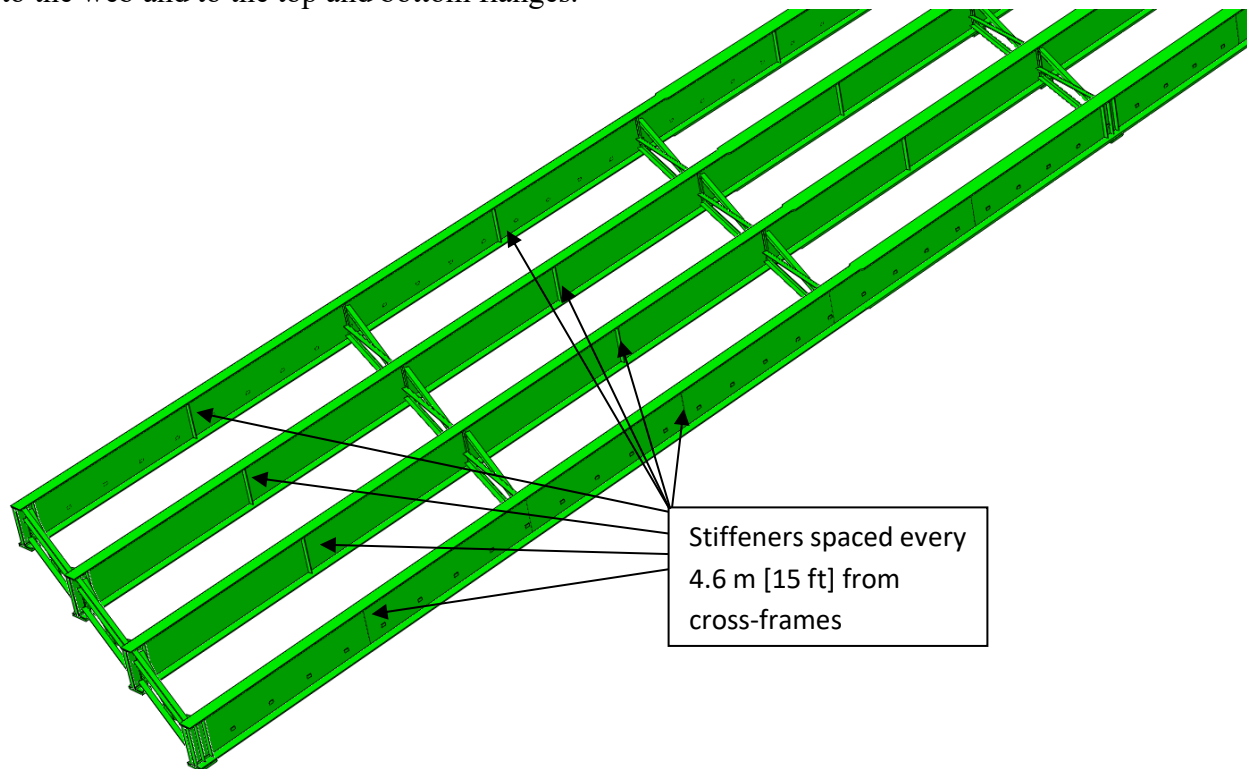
Stiffener placement in bridges with 9.14 m [30 ft] cross-frame spacing
